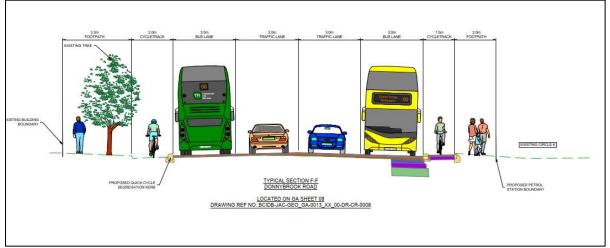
Extract from Typical Cross-section Drawing (Sheet 04)
